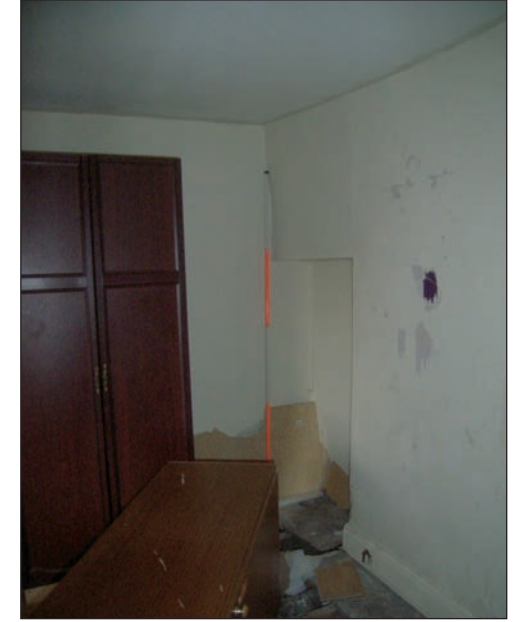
General view across Bedroom/Living Room on first floor (original Masons Arms), from the west
